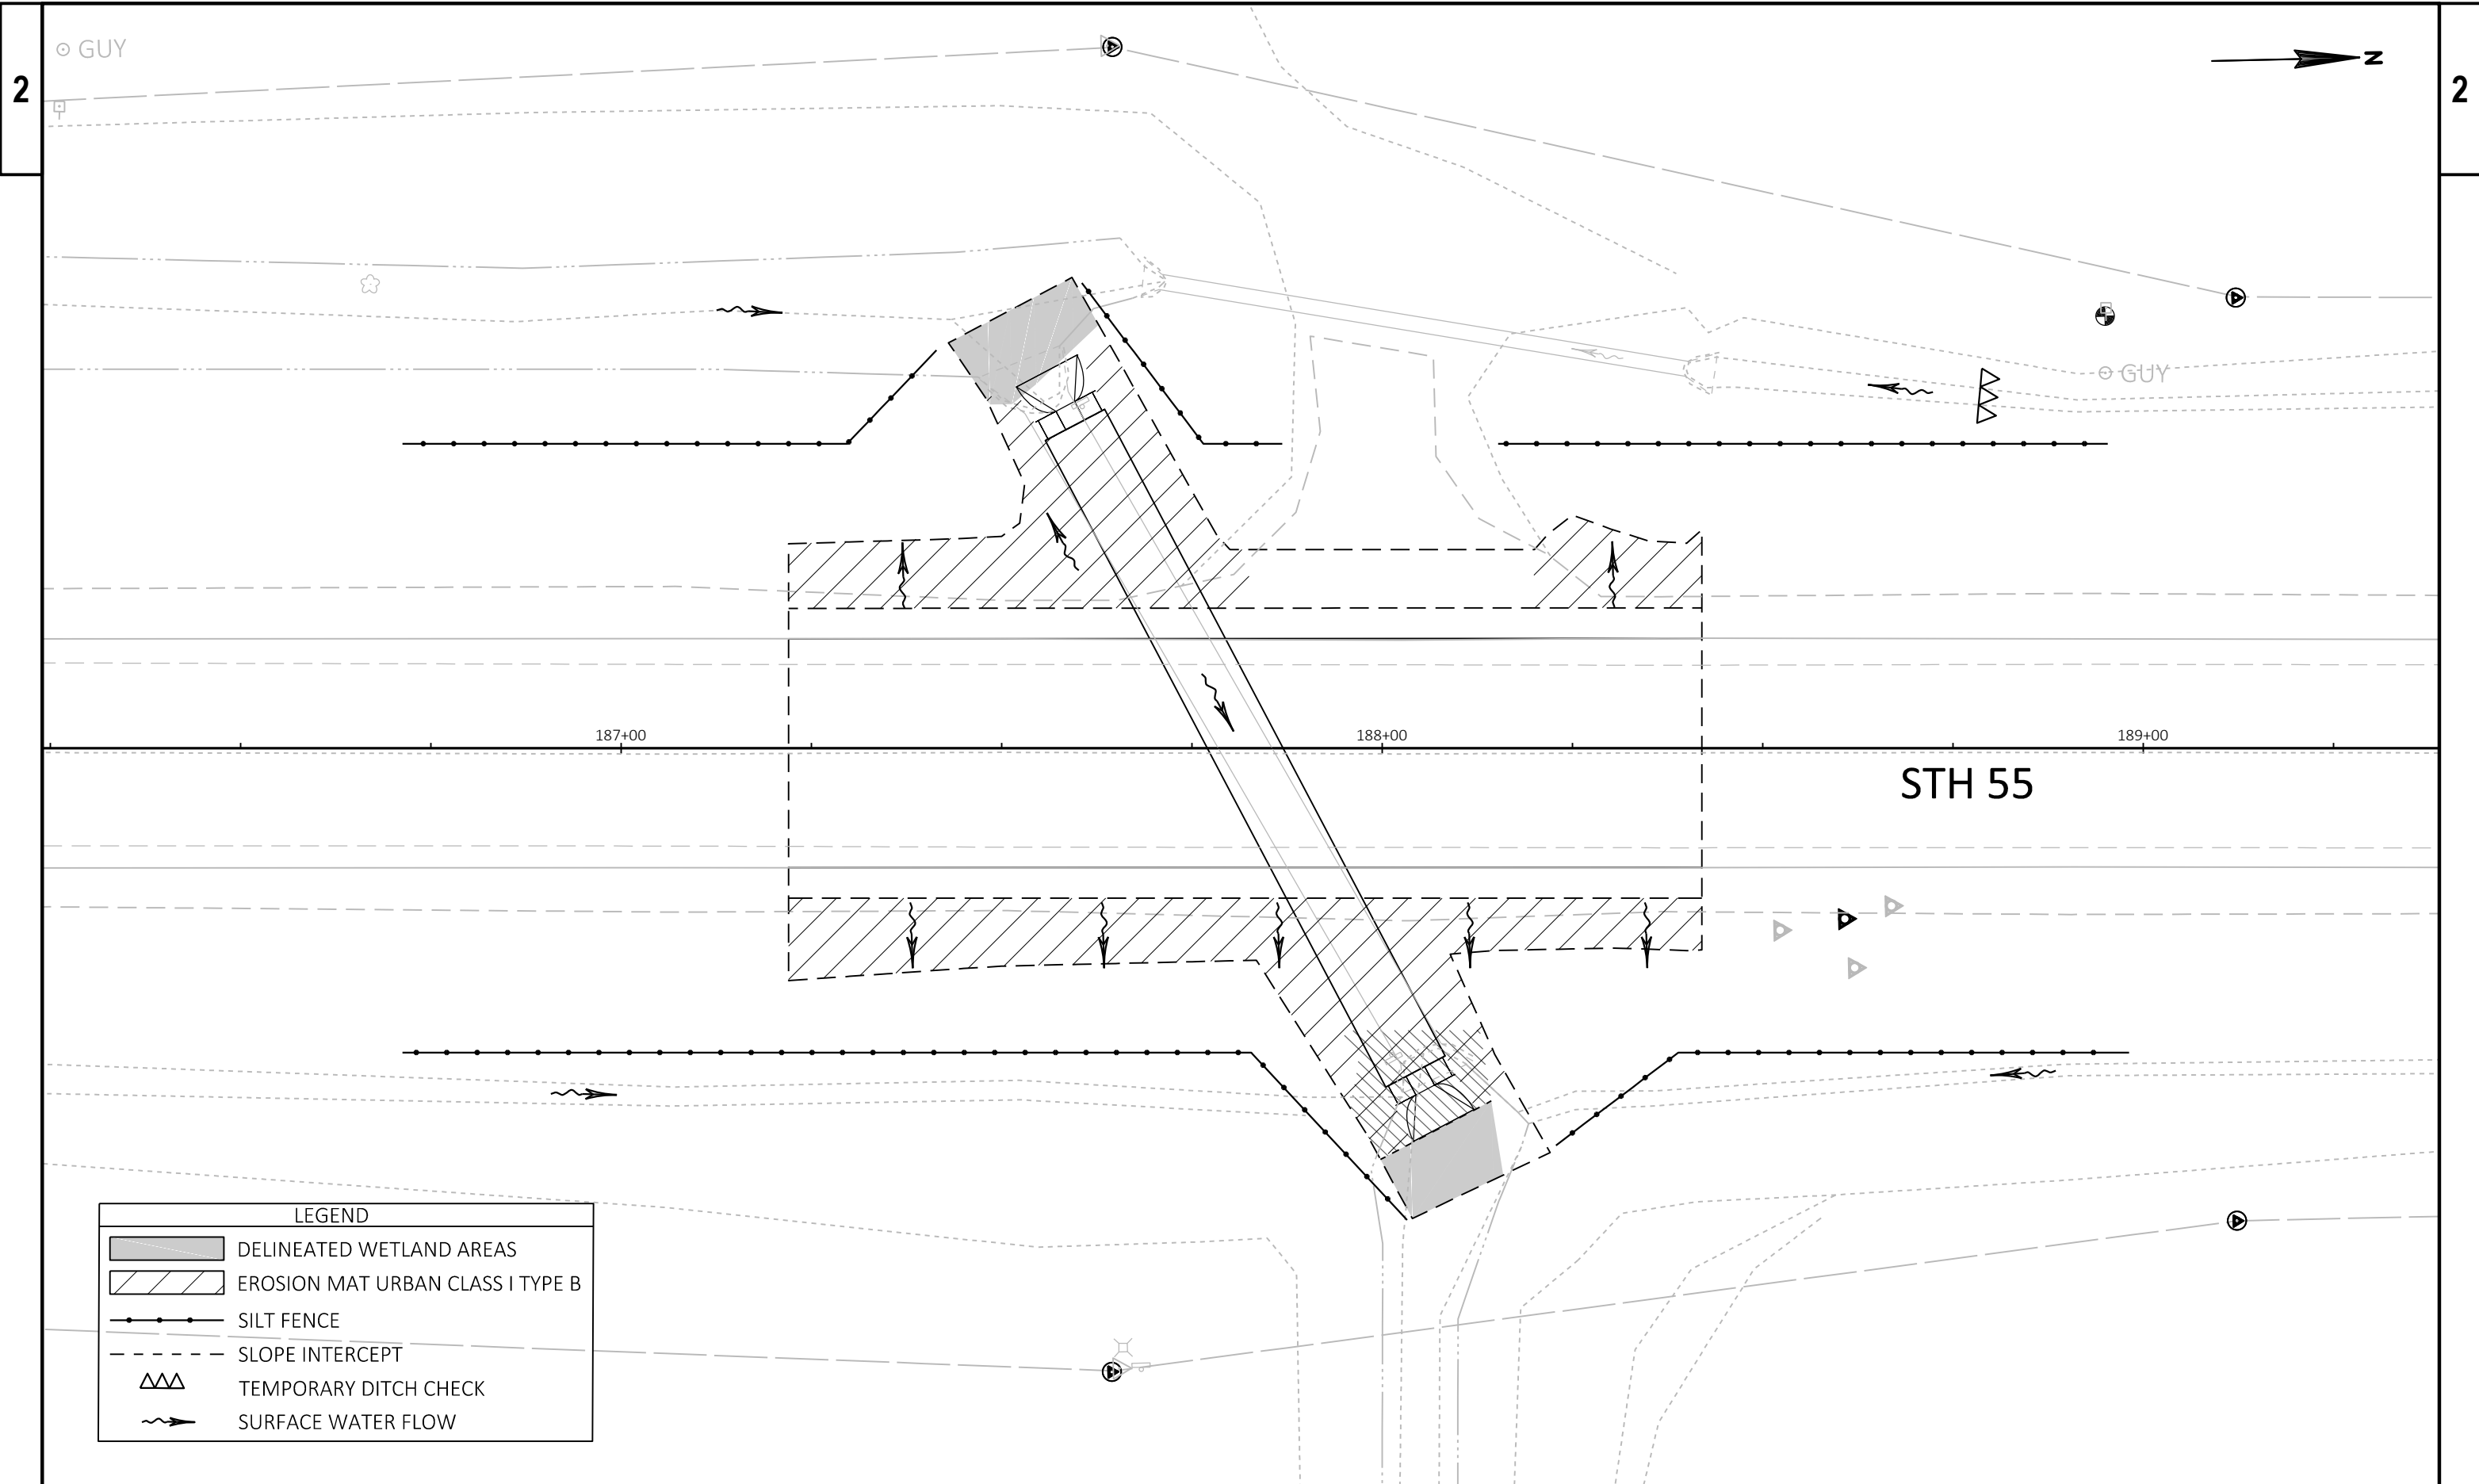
DETAIL FOR EROSION CONTROL AT CULVERT PIPES
